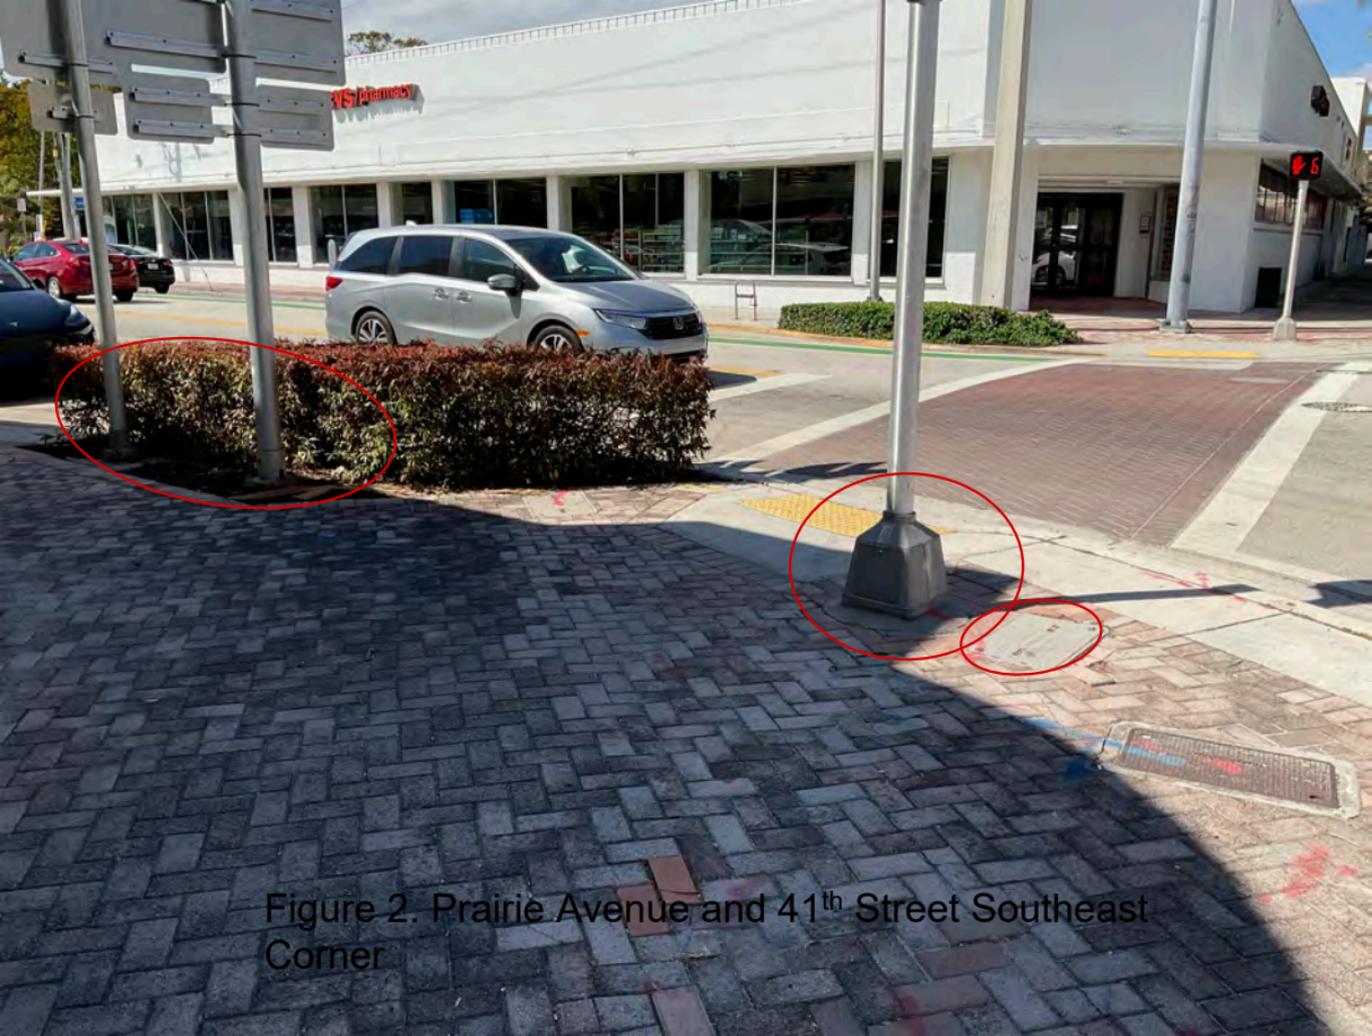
Prairie Avenue and 41<sup>th</sup> Street Southeast
